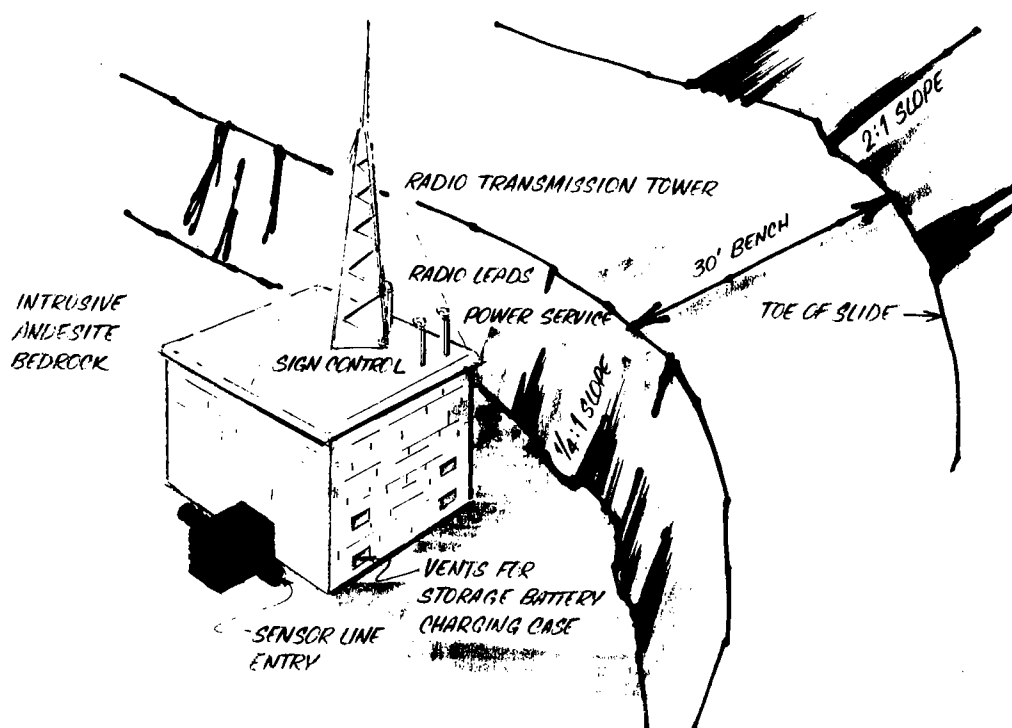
The Instrument House was constructed on Andesite bedrock. A 30-foot bench in the rock above the house will provide for creep of the slide debris in the 2:1 backslope.
